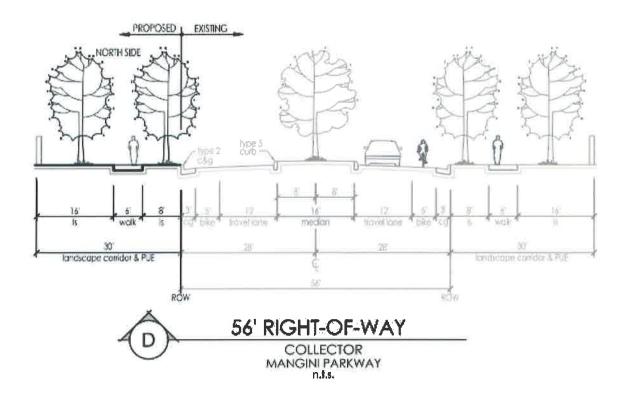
MANGINI PARKWAY CROSS SECTION
